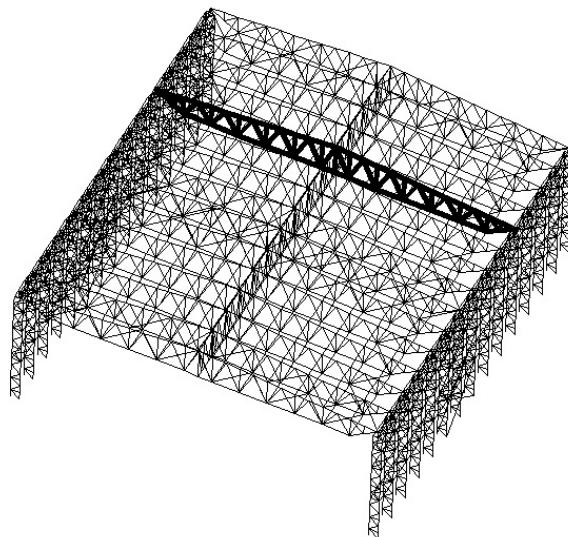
Truss with a span of 78 m and a damaged lower chord.
